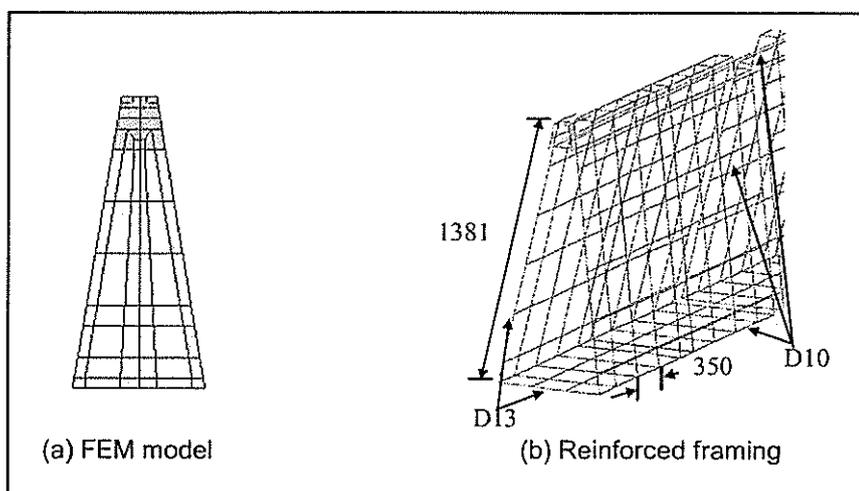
FEM Models of a Single-slope Concrete Guard Fence
